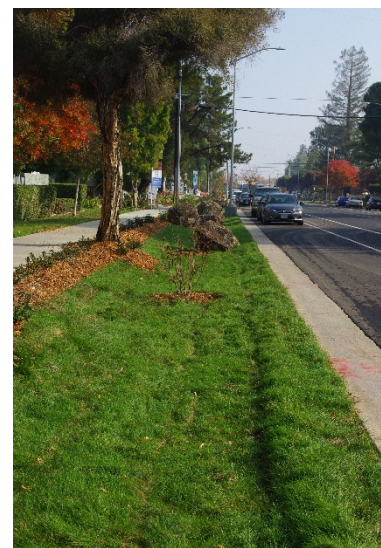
Stormwater planter, Hacienda Avenue, Campbell (Source: City of Campbell)
